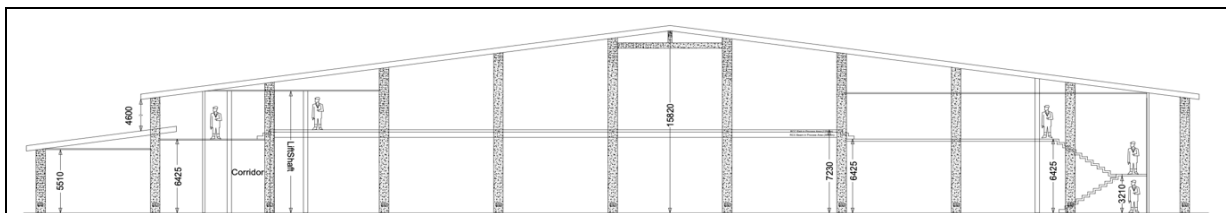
Elevation of a section through the Inflexible Block of the Sri Lankan slaughterhouse showing various service areas making use of the space between the RCC roof and the sheet steel roof.
